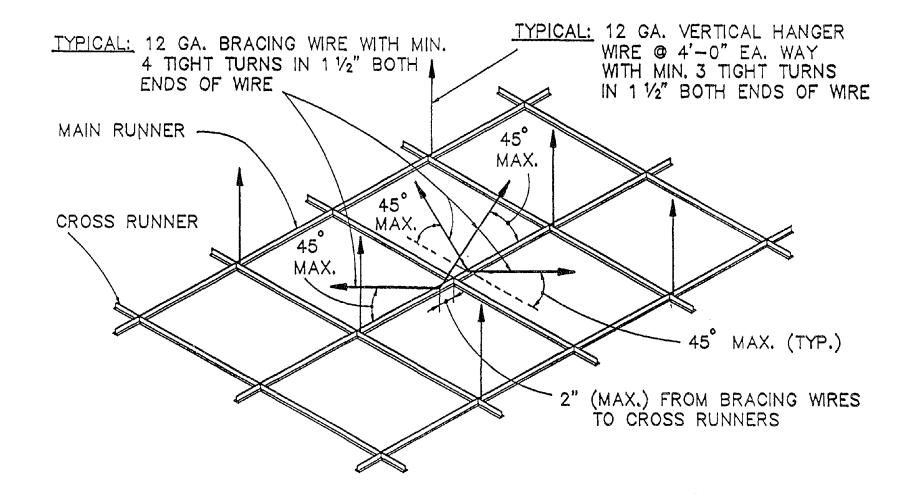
Attachment of Acoustial Ceiling.Grid:
